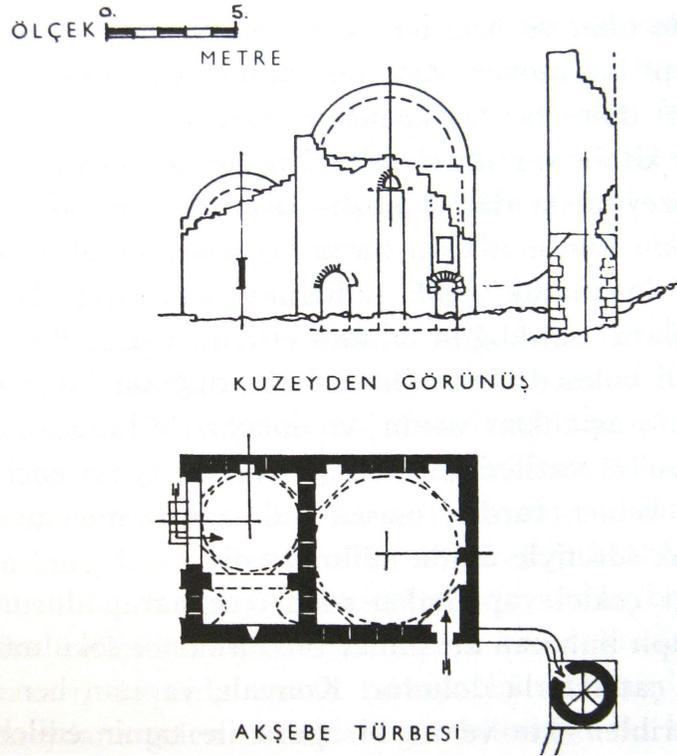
Schematic drawings of the north façade, the minaret and the plan of Akşebe Sultan around 1950's (Source: Lloyd and Rice 1989)
